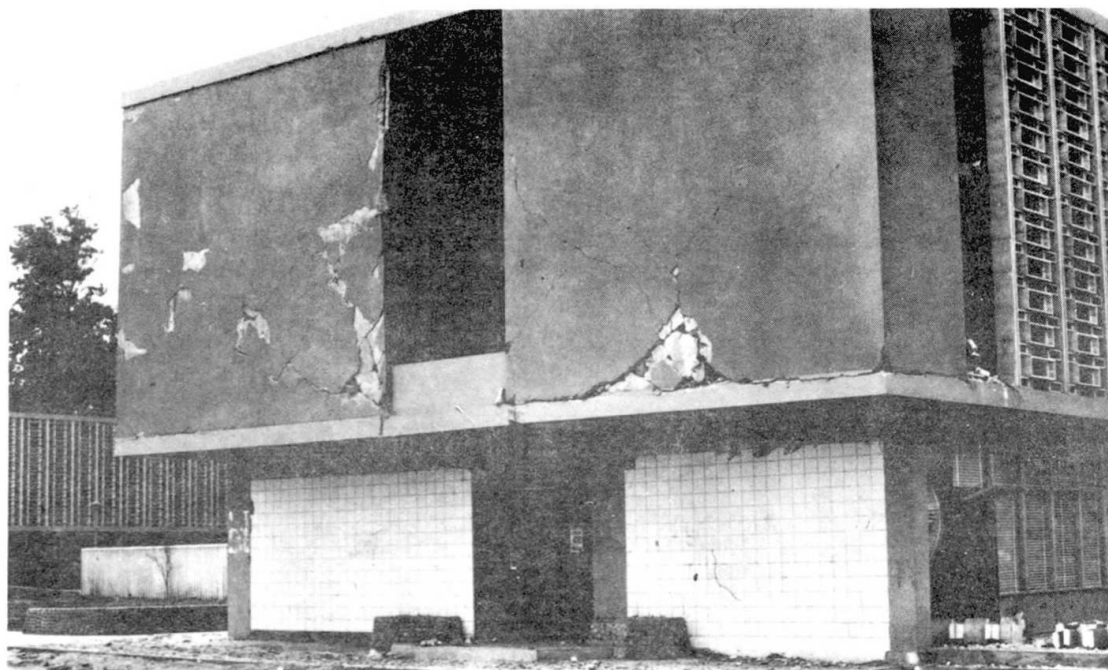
Classroom building at Agricultural University after 1974 earthquake. Stiffened first story had little damage due to added concrete wall panels, but upper stories had increased damage in this earthquake.
